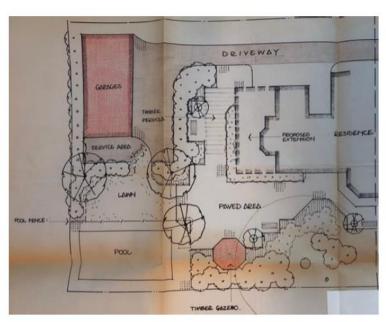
Extract from architectural plans associated with BA 202-91 showing the proposed relocation of the existing garage and gazebo (Source: Burwood Council archives).
